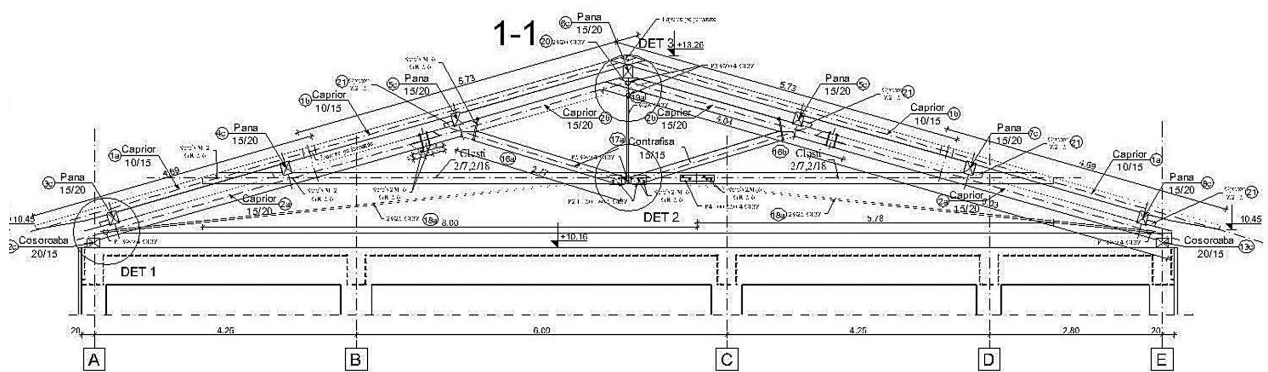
a. – Mixed roof structure with trimmers, designed for the Aleşd, Bihor country School with Classes I-VIII.
